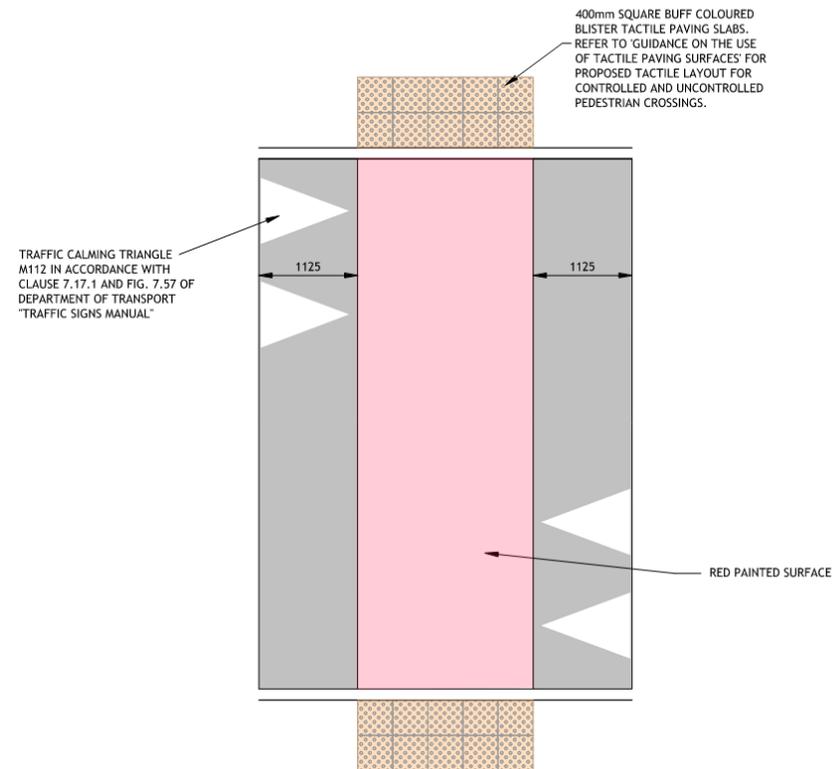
Table Top Detail (Extract from PUNCH Drawing 172439-PUNCH-XX-XX-DR-C-0402)
